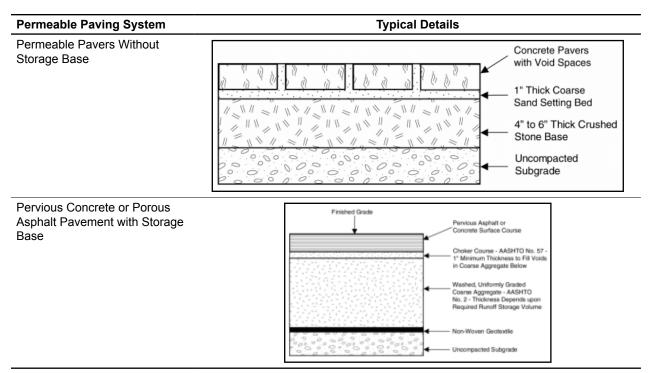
Typical Details of Permeable Paving System<sup>81</sup>
